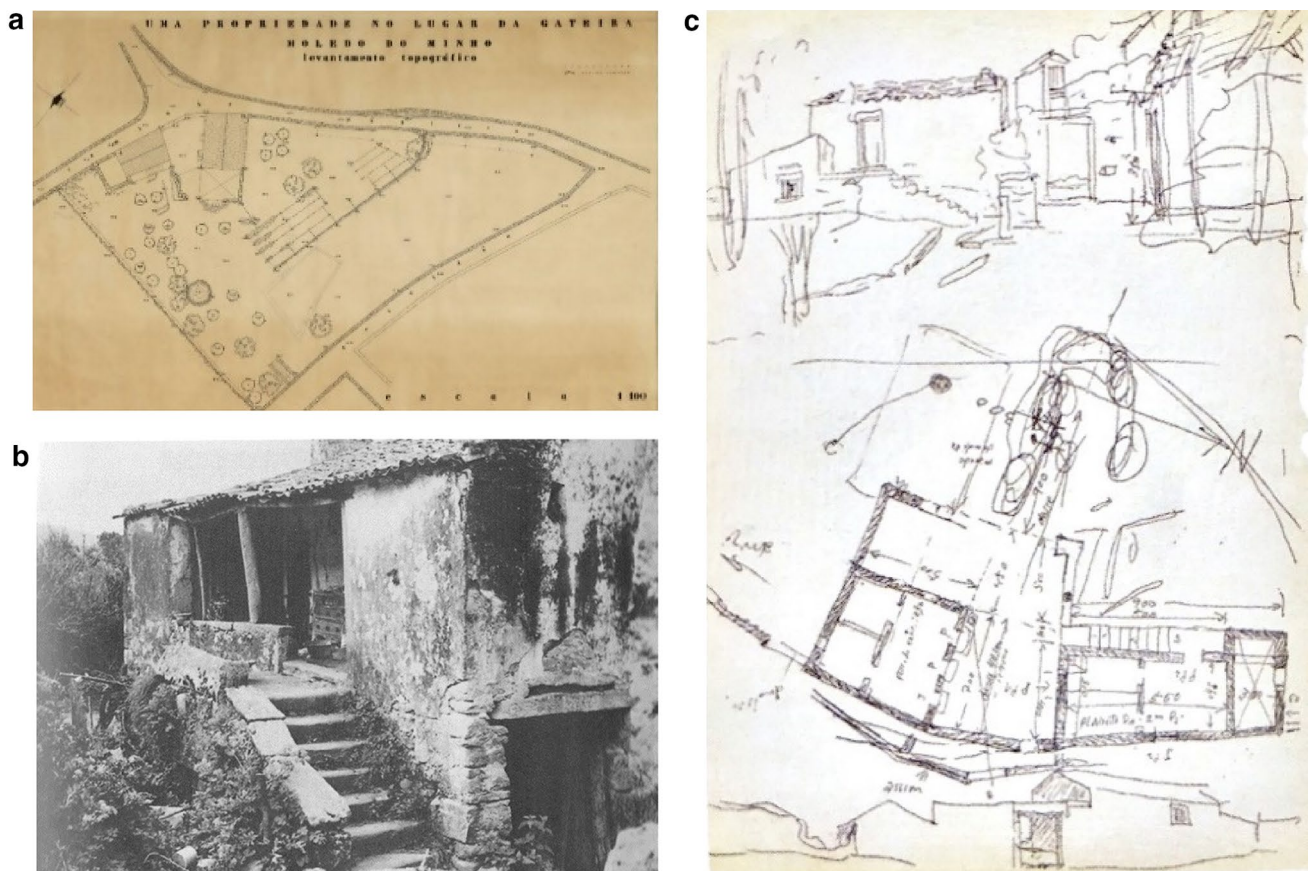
Previous state: a Topographic survey, 1970 (Fundação Serralves, PT-FS-ASV-12-3-4-0009); b Casa da Gateira before intervention [21]; c Sketch before intervention [15]
